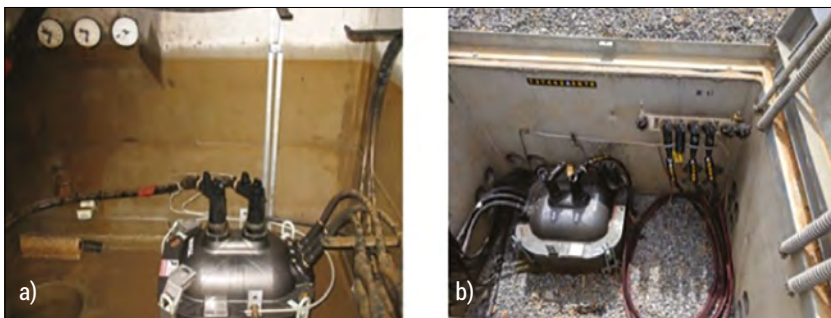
SIDTs installed in North America: (a) concrete structure (b) open-bottom structure
